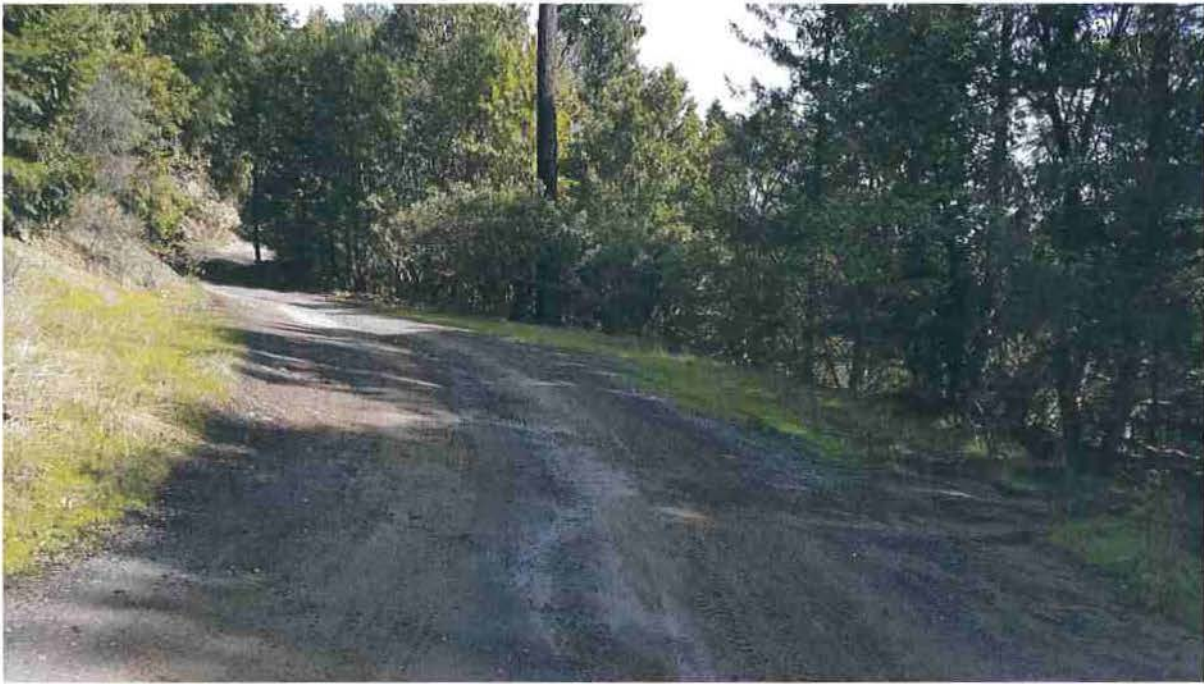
Photograph showing road point RP36 where the roadway has pot-holes. The roadway surface needs to be regraded in this location.
